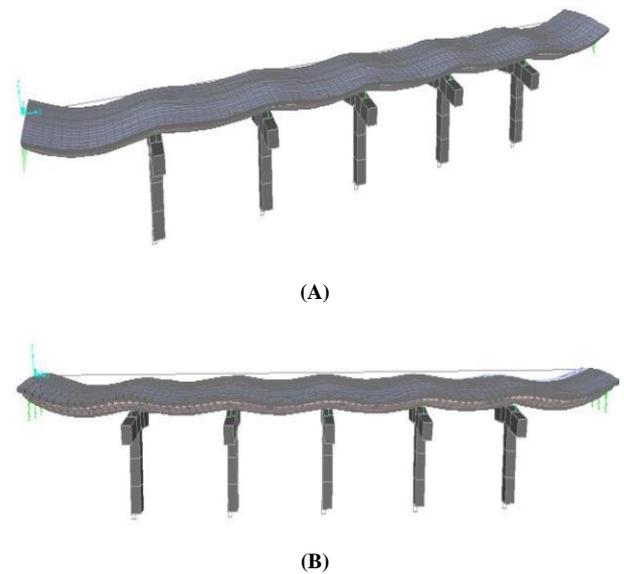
Vertical Deflection of Continuous Box Girder Prestressed Concrete Bridge Model: (A) Due to Prestressing Tension Force, (B) Due to Service Loads.
